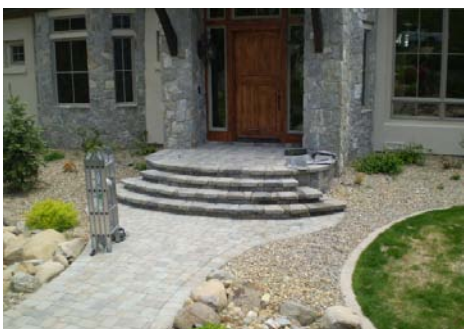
NO HAND RAILS AT ENTRY STAIRS
